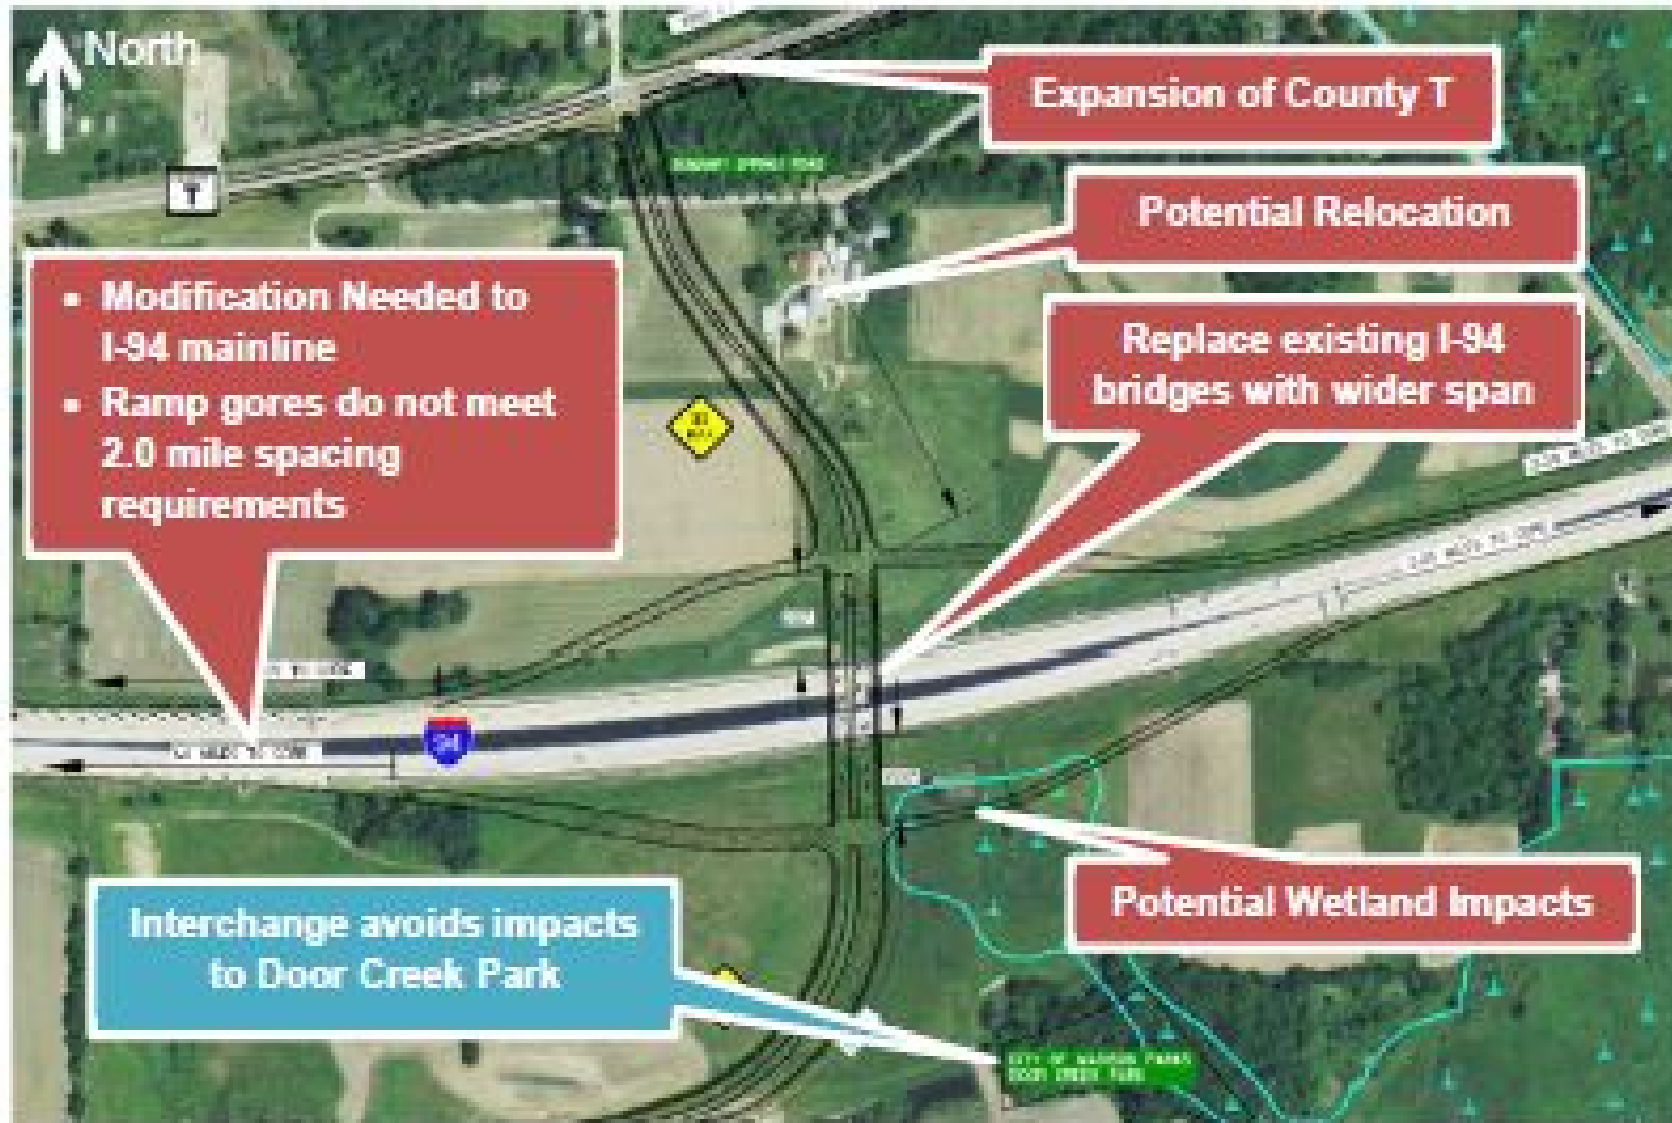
Potential Milwaukee Street Extension Alternative B Design
